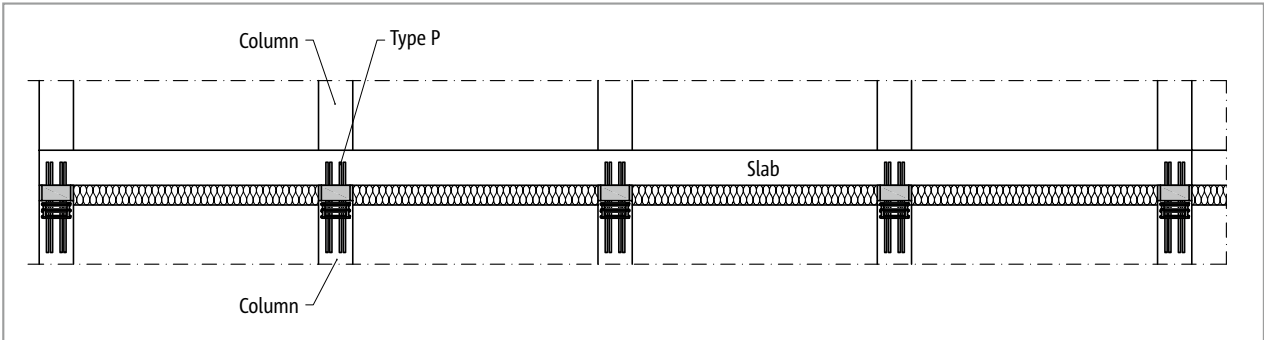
Schöck Sconnex® type P: Column connection to the floor above
